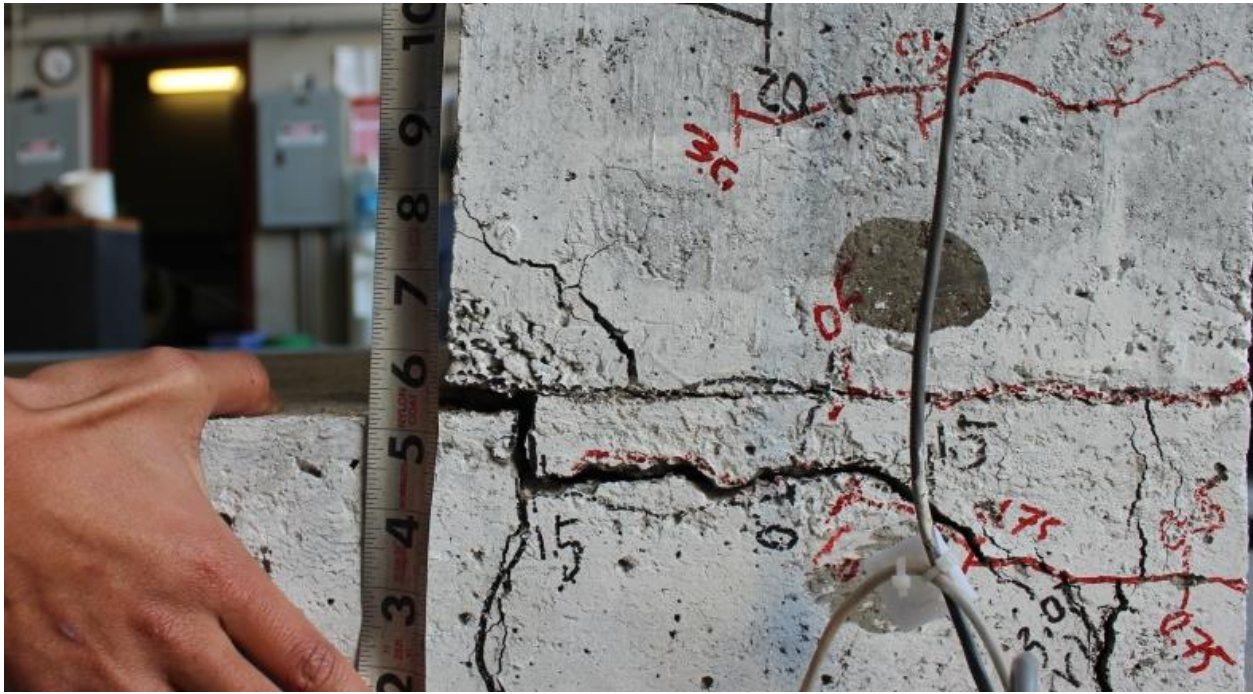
Flexural cracks at base/north wall interface during positive extension at 6.0% drift ratio (Cycle 23-24). Picture of East face at North wall slab interface looking West.
